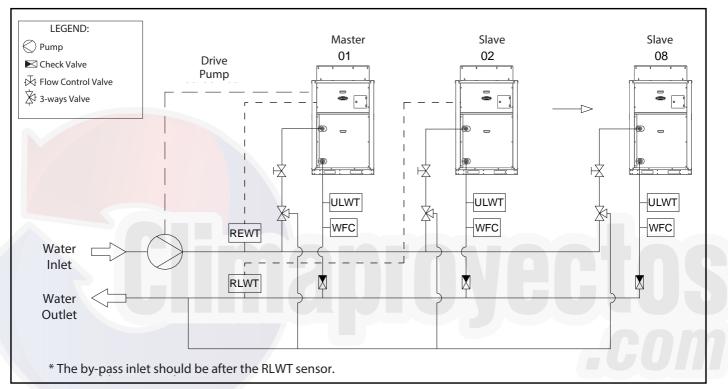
Typical Interconnection schematic drawing with a single 3-way valve pump
